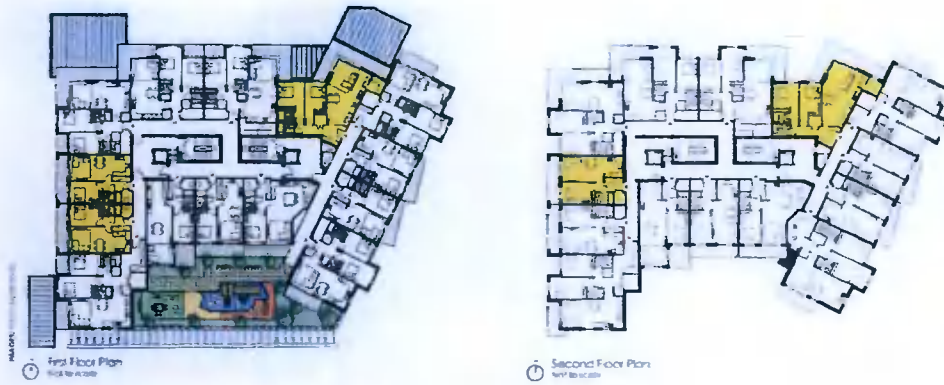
Applicant scheme includes 11 no. primarily north facing apartments = overdevelopment (1)
